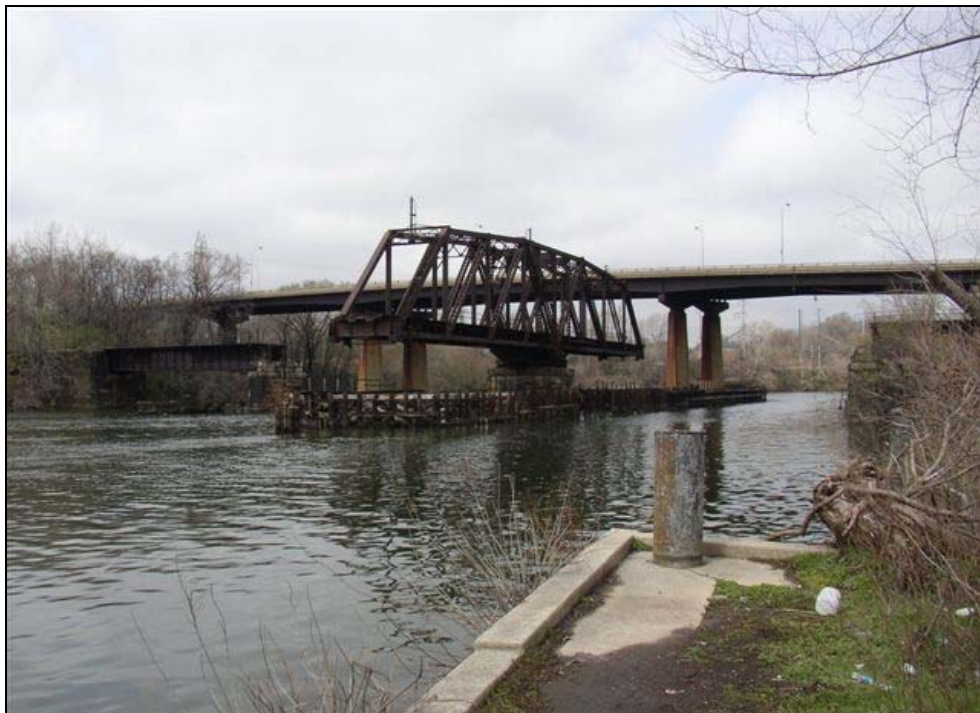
Looking North at Existing Swing Truss Bridge and Grays Ferry Avenue Highway Bridge
